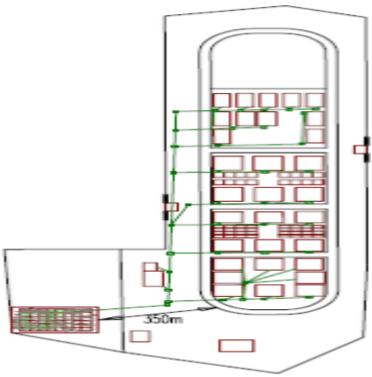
Proposed Sewer Pipe network for CBN Housing Estate.
